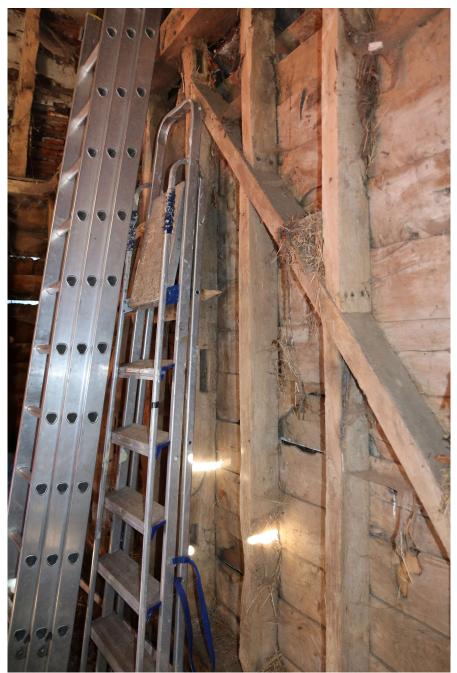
Detail of Baltic timber mark on north-western wall-plate in barn, Bay 3. Photograph taken facing north-west.
